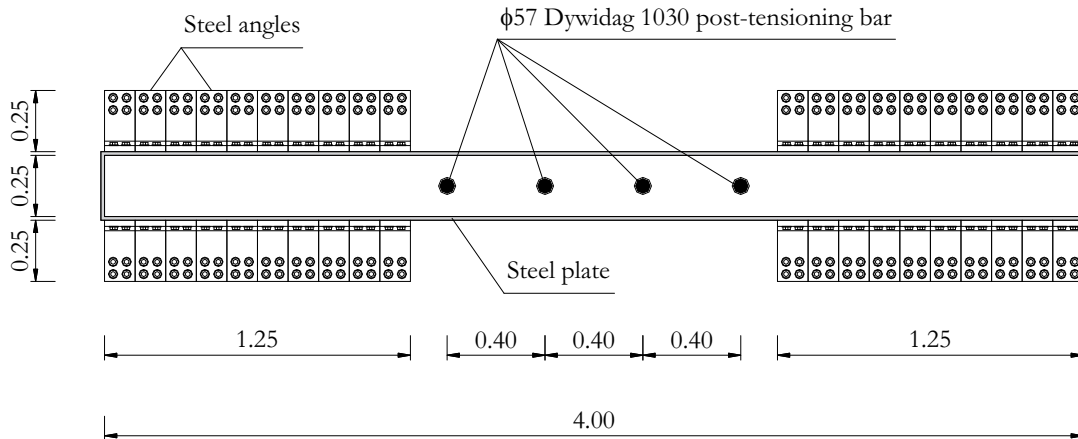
Wall base section detail for the hybrid system. (Dimensions in metres)
